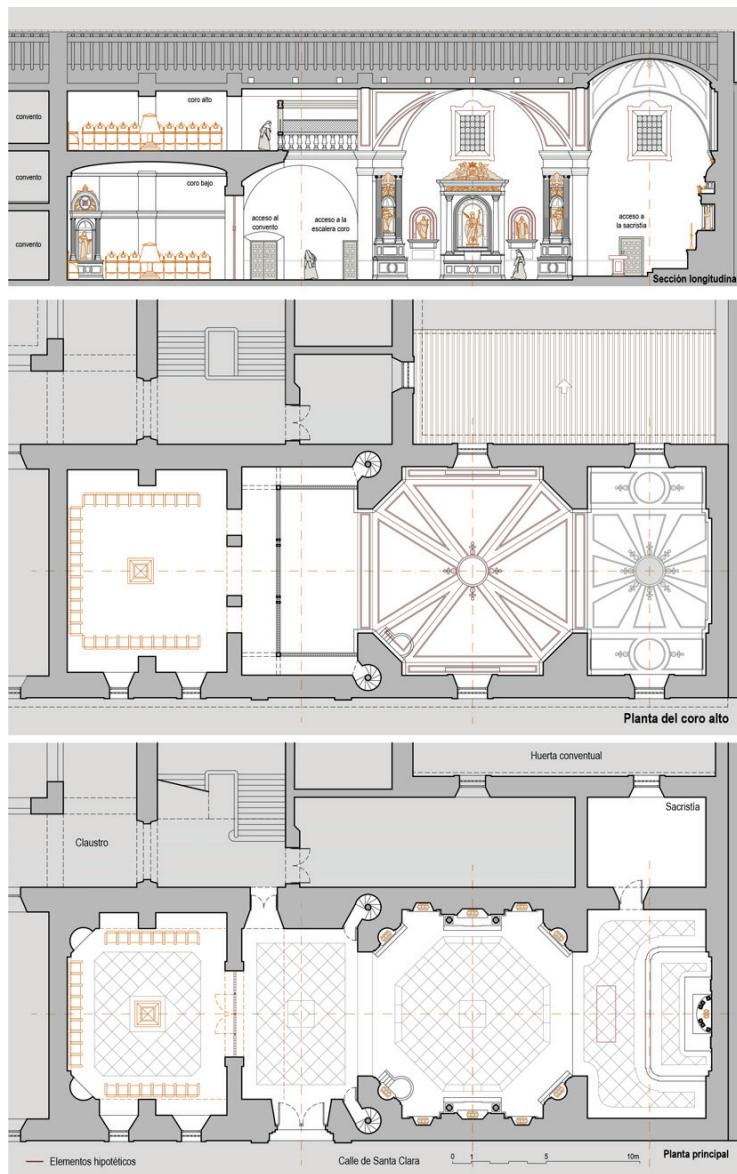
Plans and longitudinal section of the chapel (Own elaboration).
